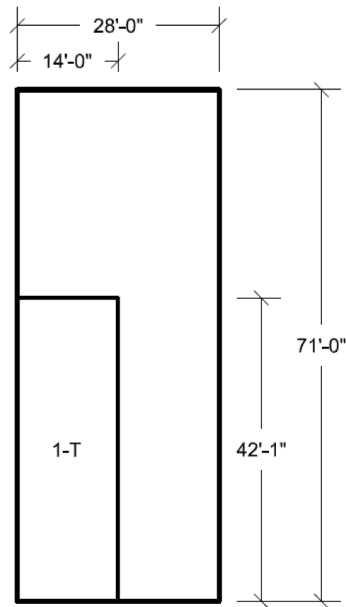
H.6-107 UHS Basin East Buttress Looking North & UHS Basin West Buttress Looking South Transverse Reinforcement Zones
